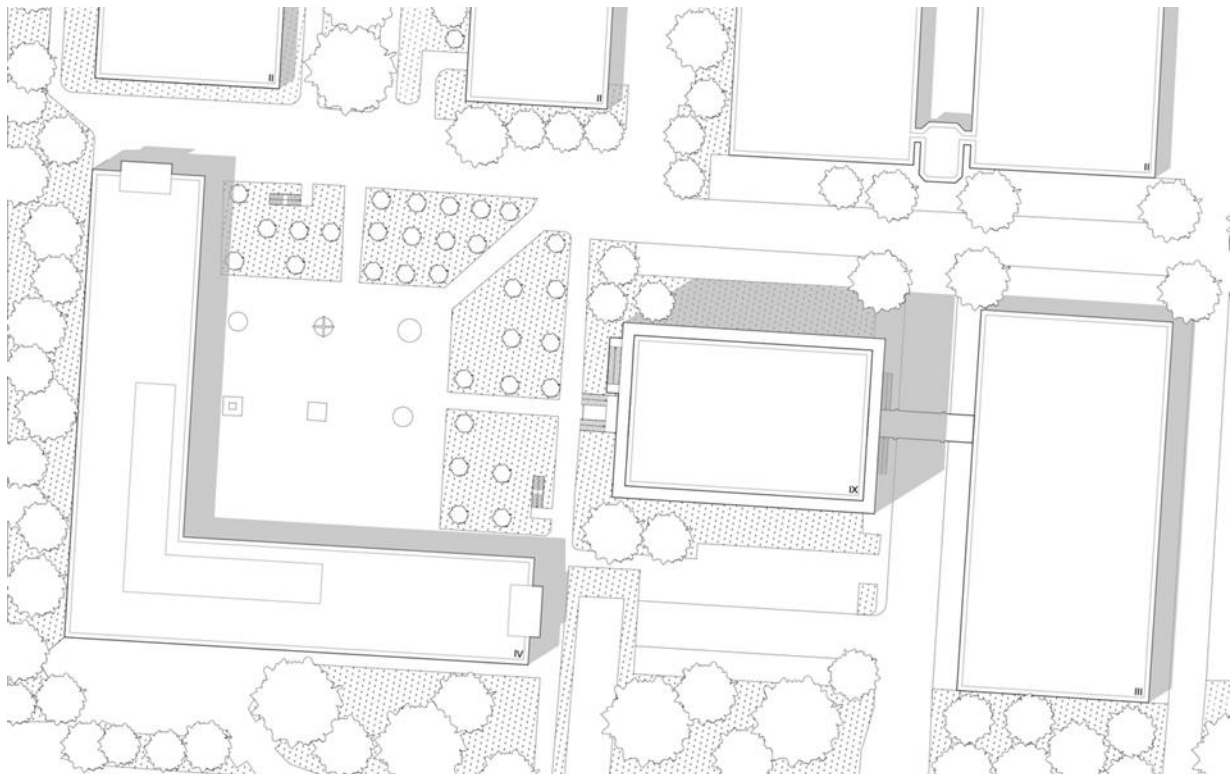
Site plan of the existing building under investment for the timber-reuse retrofitting.
